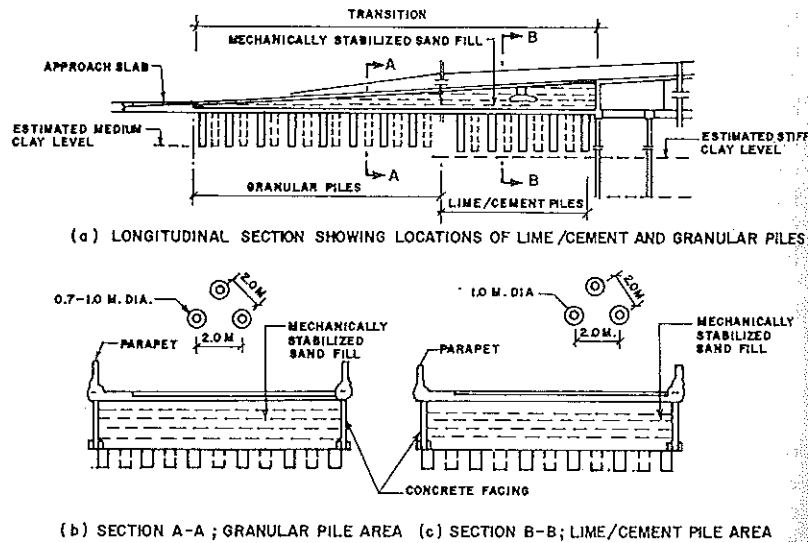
Granular Piles with Mechanically Stabilized Embankment
